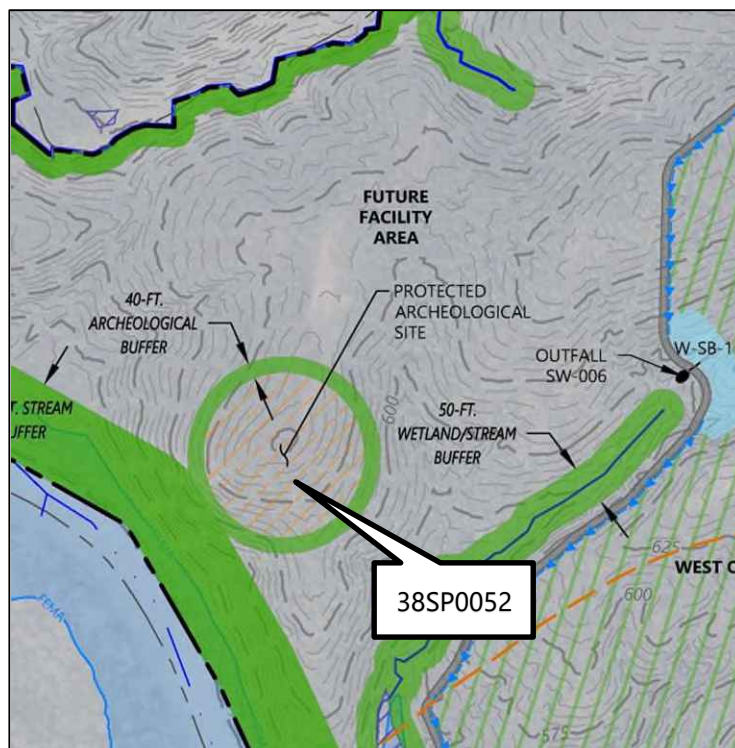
Portion of the conceptual plan showing avoidance of site 38SP0052.
